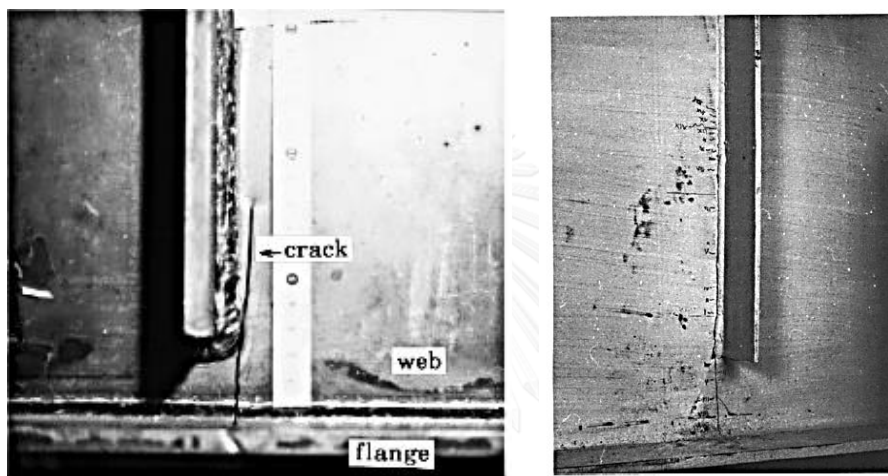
Fatigue crack propagation of steel I-beams with welded transverse stiffeners [6, 7]
